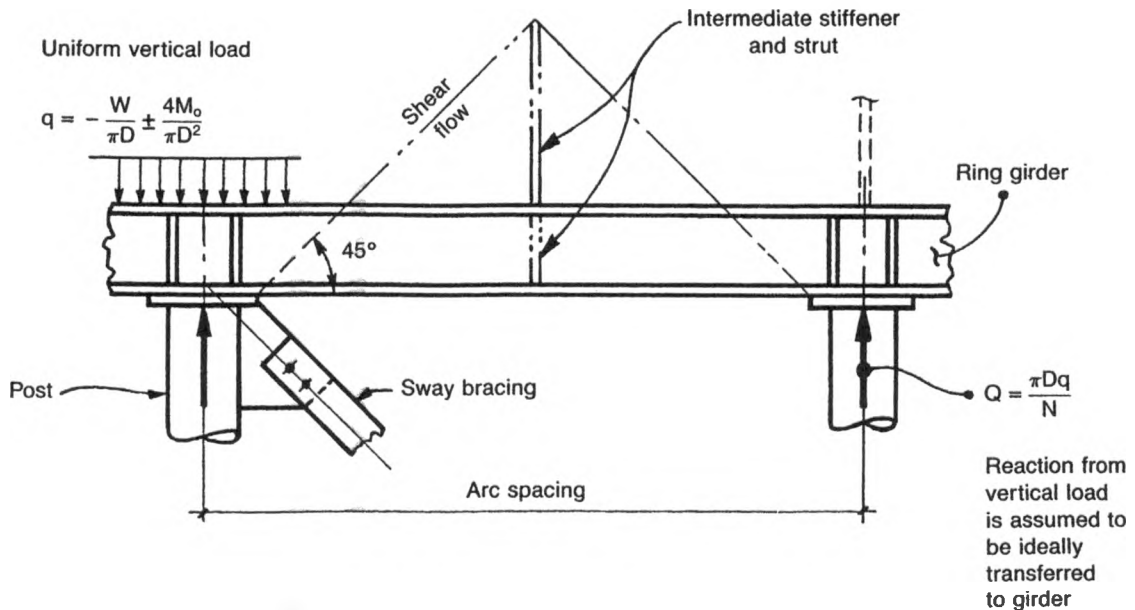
Loading diagram for a ring girder: vertical forces on a ring beam.
